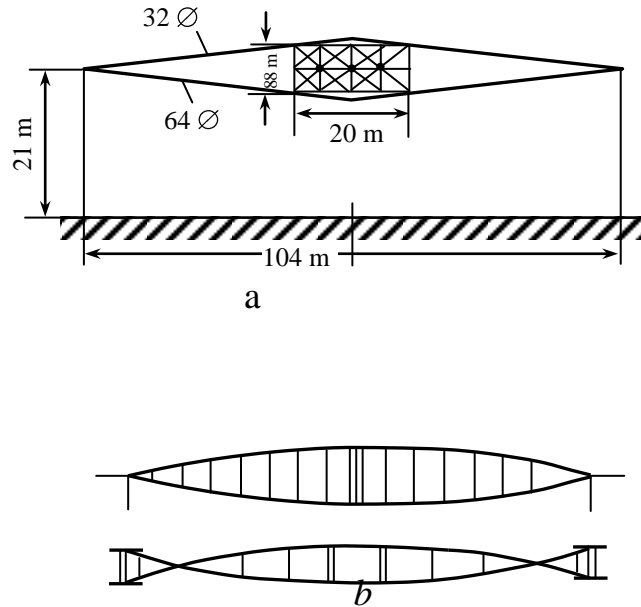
Convex suspension roofs and roofs with tie rods
